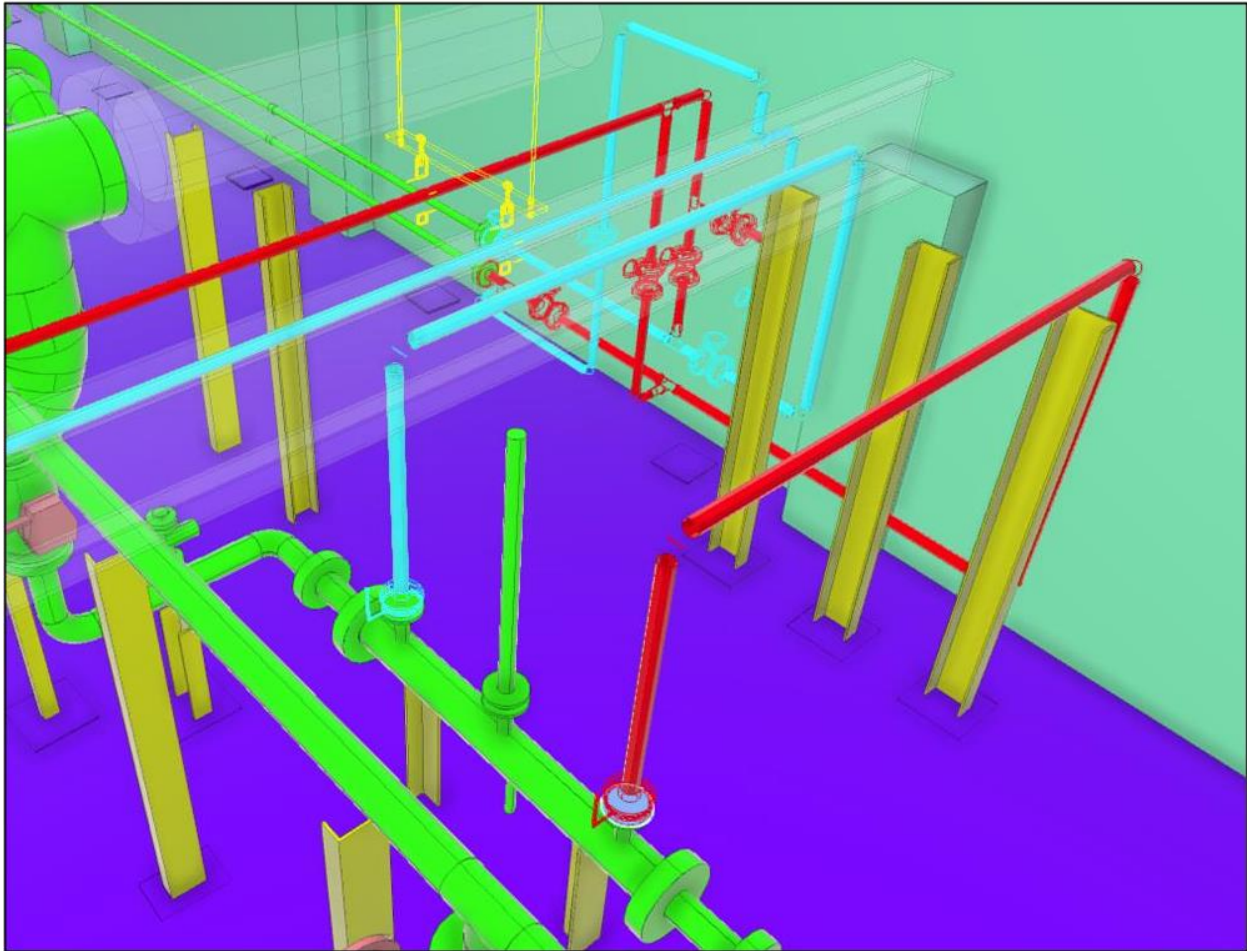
3D view of connection to existing High Pressure - Medium Pressure Heat Exchanger (North view).
